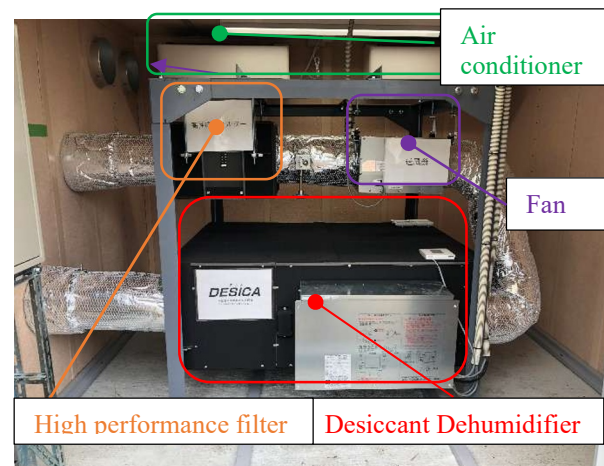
Internal layout of the machine room, including the desiccant dehumidifier, booster fan, air conditioner, and high-performance filter for outside air treatment.
